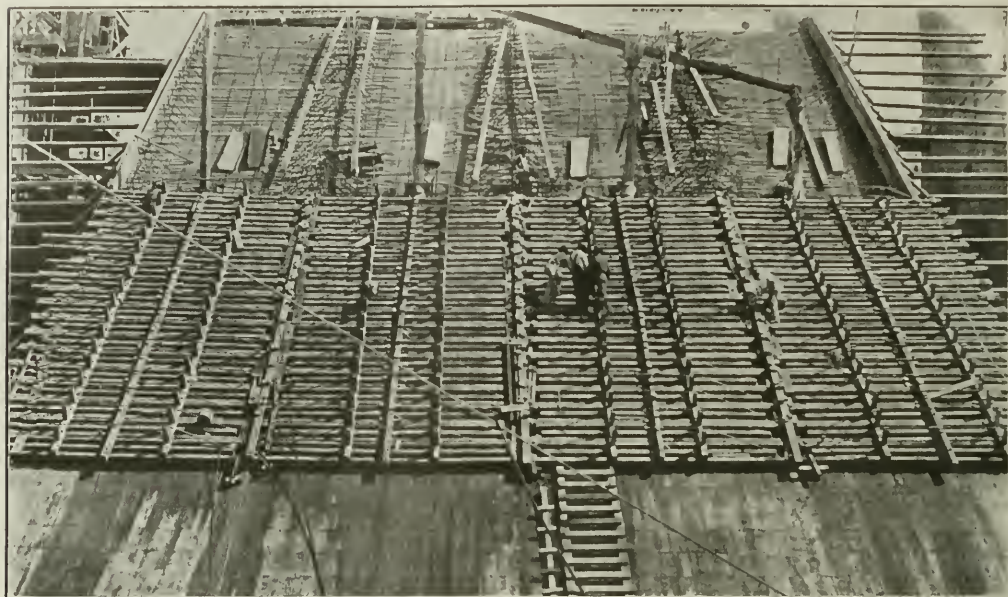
CONCRETING DECK SLAB UNIT BETWEEN EXPANSION JOINTS
